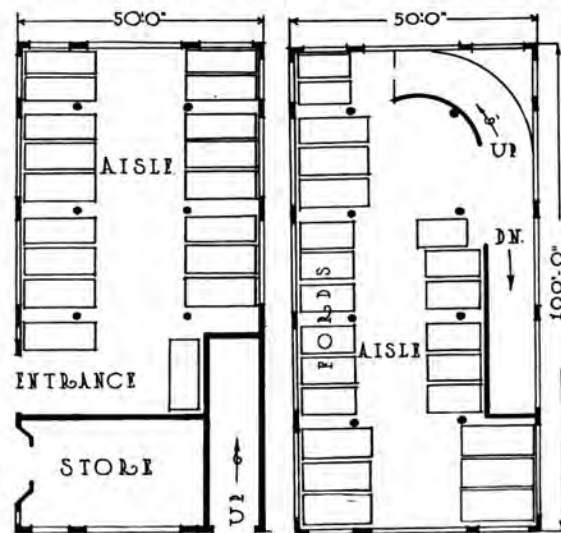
First and Second Floor Plans Showing Efficient Design of Ramp in Narrow Building
